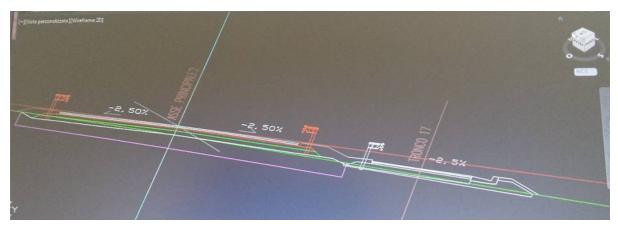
Redesign stage of the cross section from the 2D drawing using 3D polylines and a specific layer for each 3D road component
